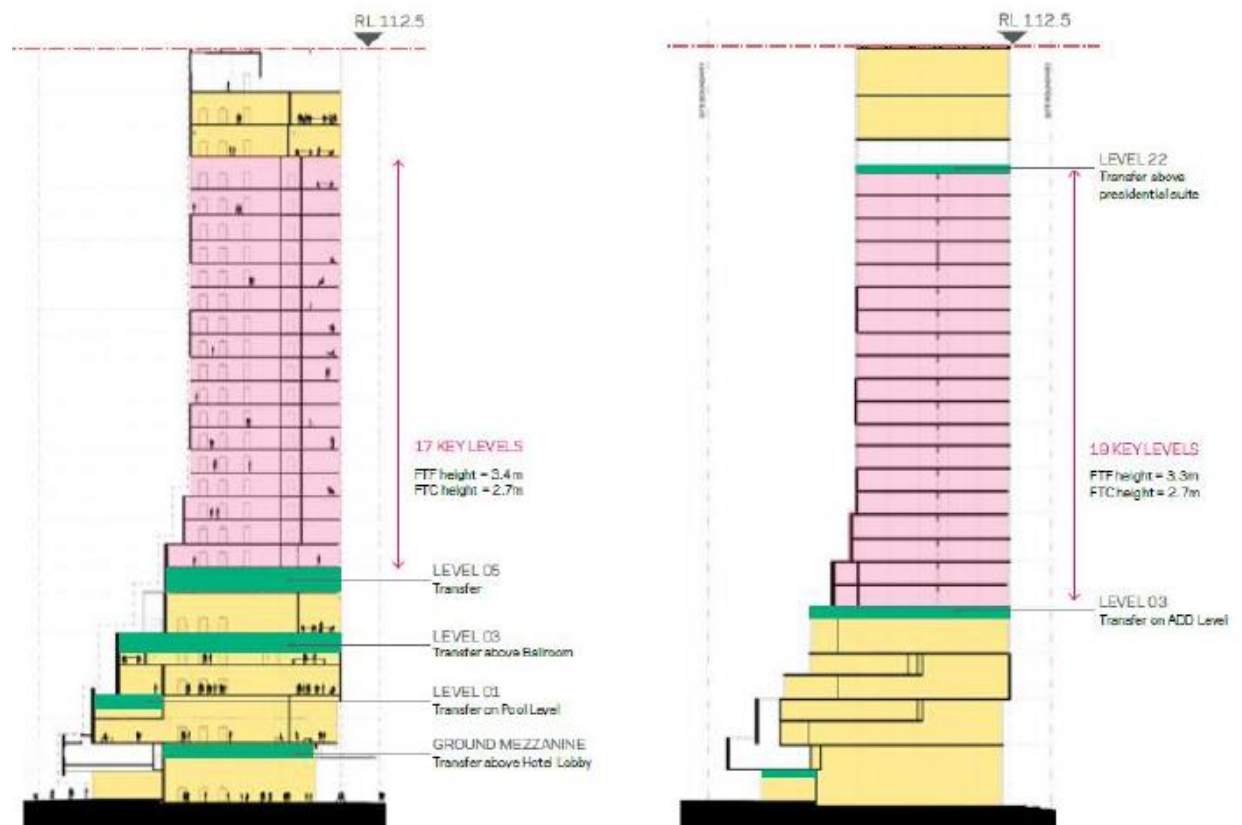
Diagrammatic view of the hotel building structure as approved (left) and as proposed to be modified (right).
